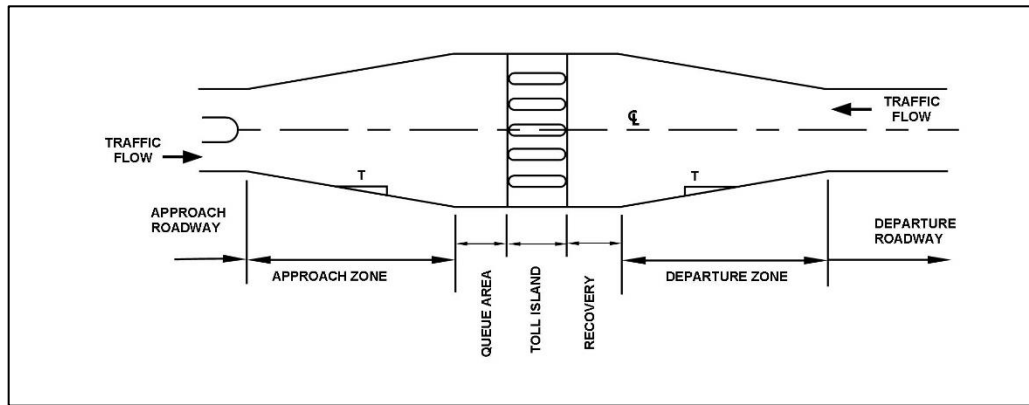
A typical toll plaza layout (Pickett et al., 2008).
